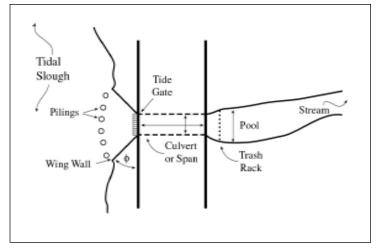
Schematic view of flood box with tide-gated culvert. Tide gate is attached to downstream end of culvert. Supplementary structures are pilings, trash rack, and wing walls.
